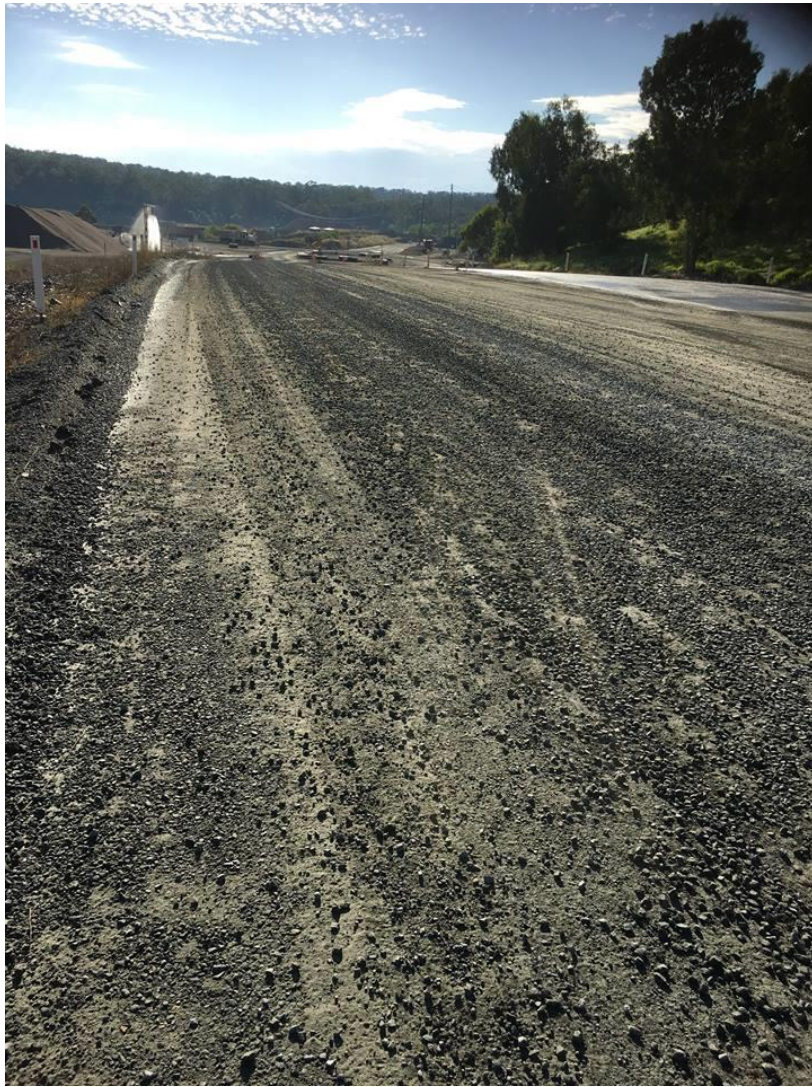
3: Treated section of pavement facing North West on 20 July showing no visible defects
